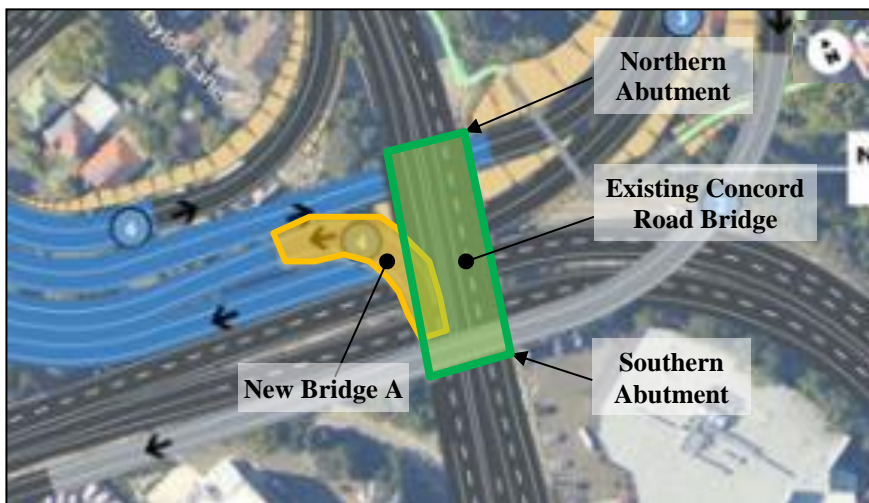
Proposed new bridge adjacent to the existing Concord Road Bridge – Indicative
